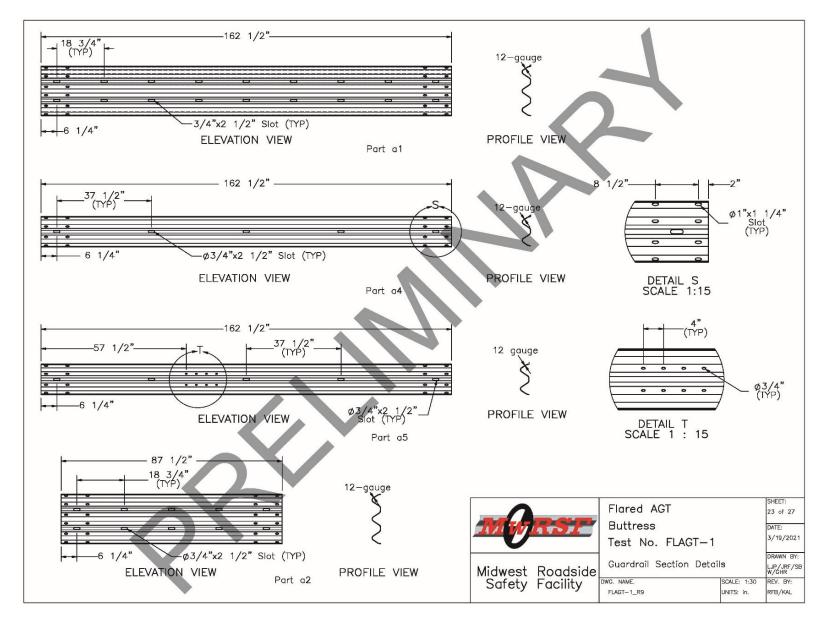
Guardrail Section Details, Test No. FLAGT-1
